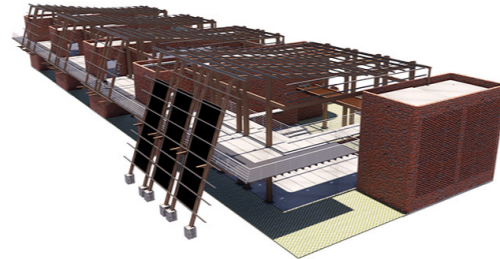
PHASE 3 - STEEL BEAMS, COLUMNS & WALKWAY. COMPOSITE BOND-DECK FLOORS. PERMEABLE PAVING AT EXTERIOR SPACES. (Author 2018).
